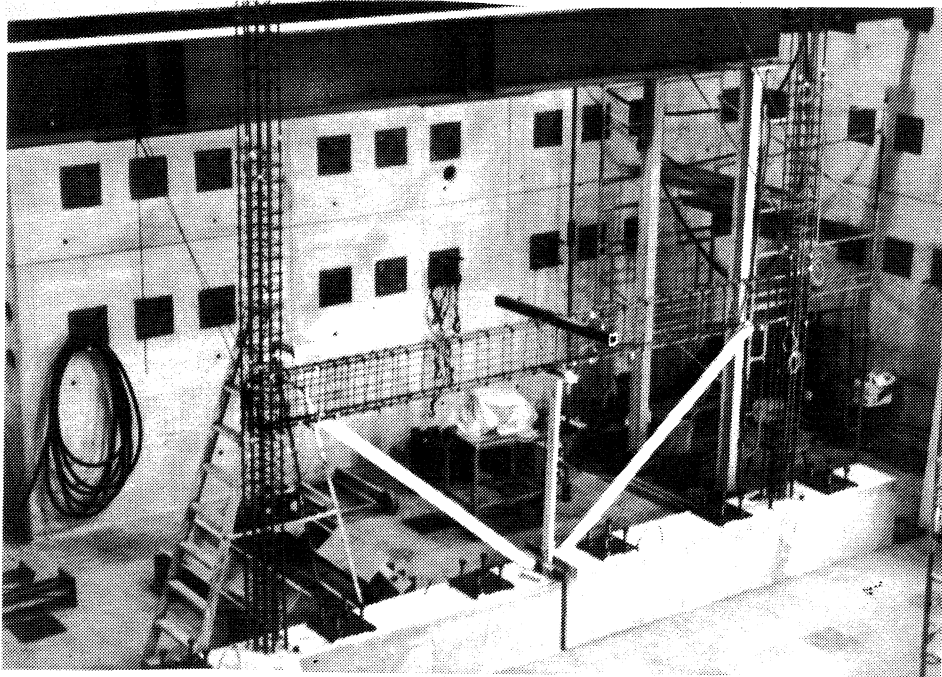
Placement of The Reinforcing Cages on The Foundation
